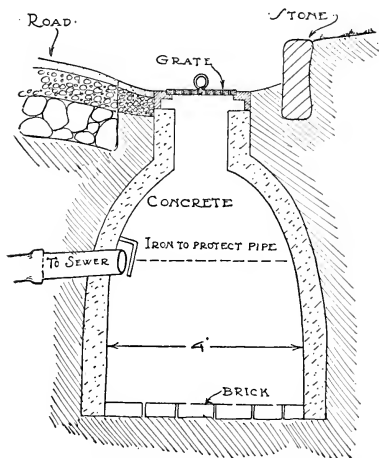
Cross section of an efficient concrete catch basin with removable grated cover to permit cleaning it out. Note the iron shield or fender to keep debris out of the drain leading to the sewer
